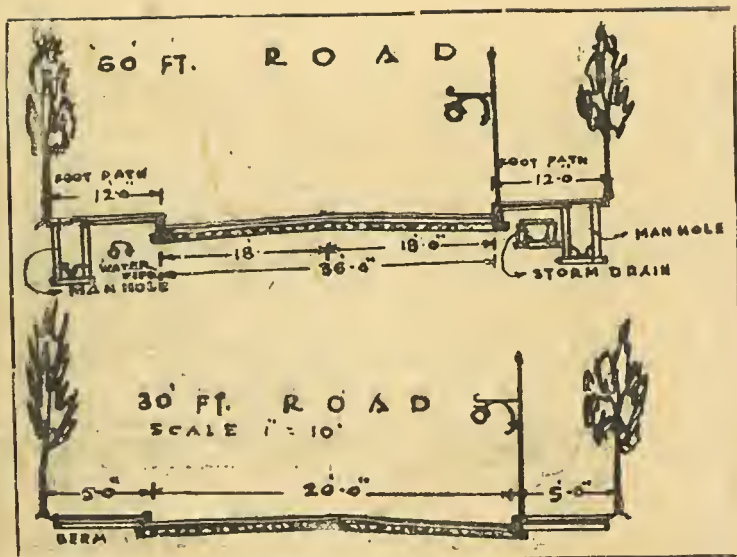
TYPE DESIGN OF 60 FT. SUB ARTERIAL ROAD AND 30 FT. LOCAL ROAD.
